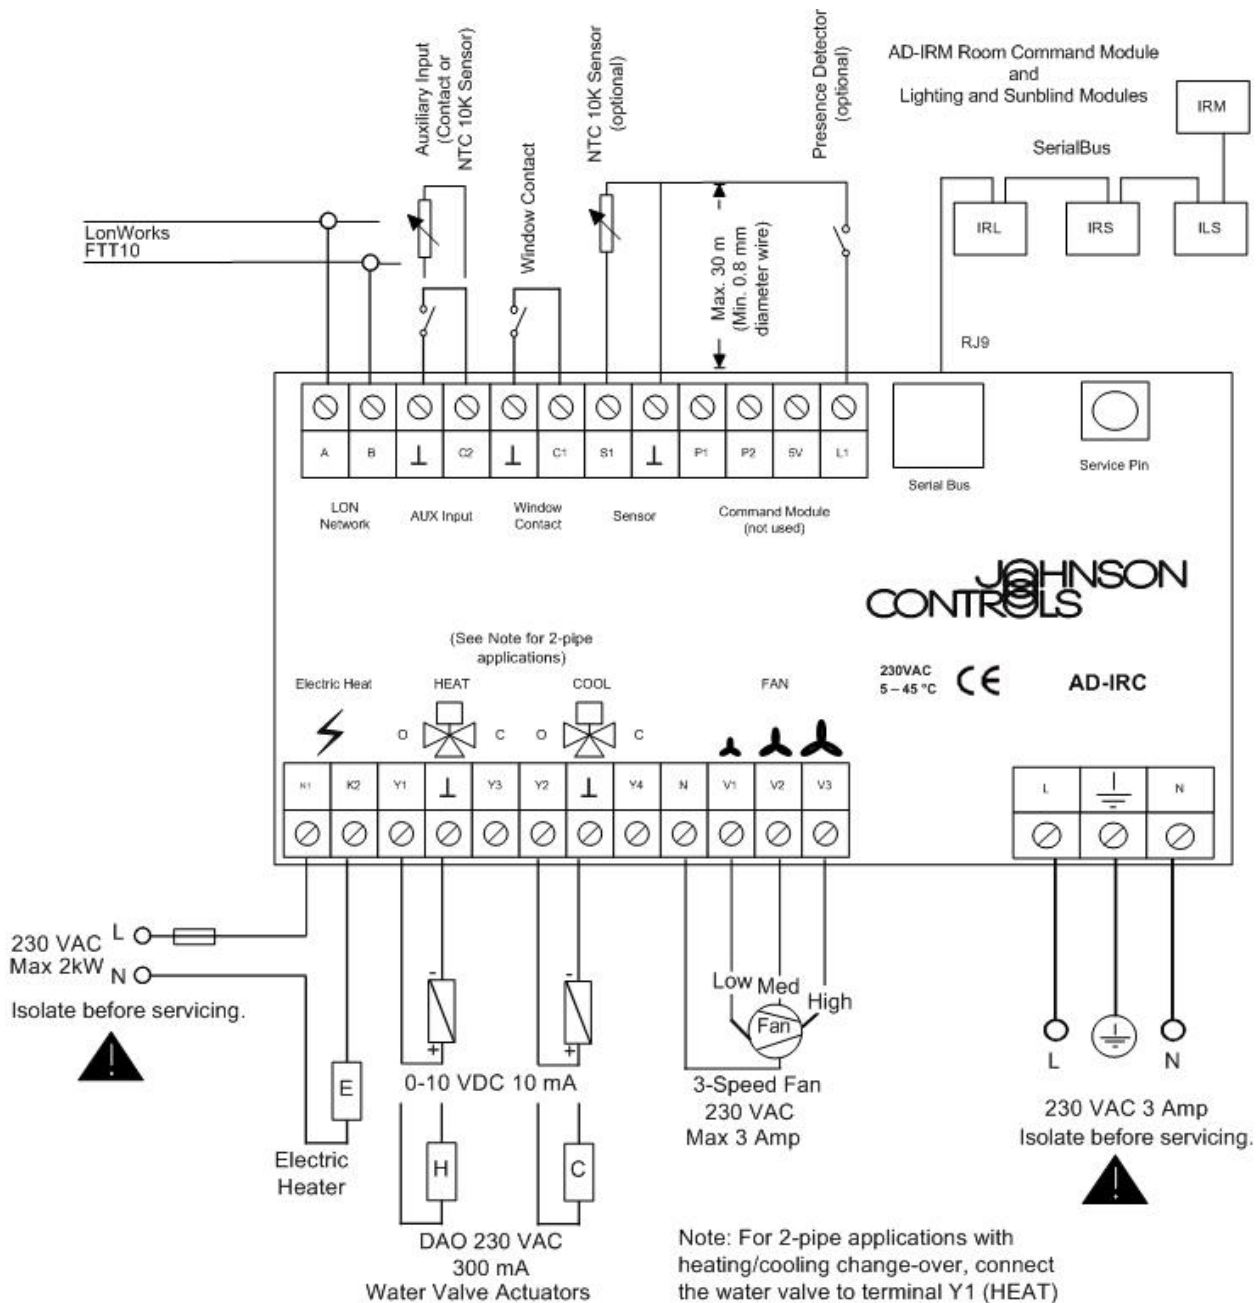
AD-IRC Fan Coil Unit Controller Wiring Details
